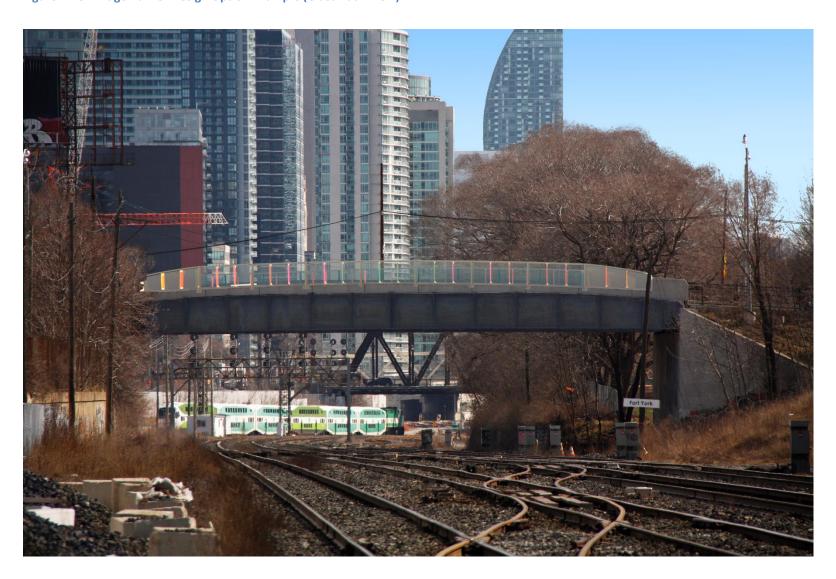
Bridge Barrier Design Option Example (Glass Back View)
